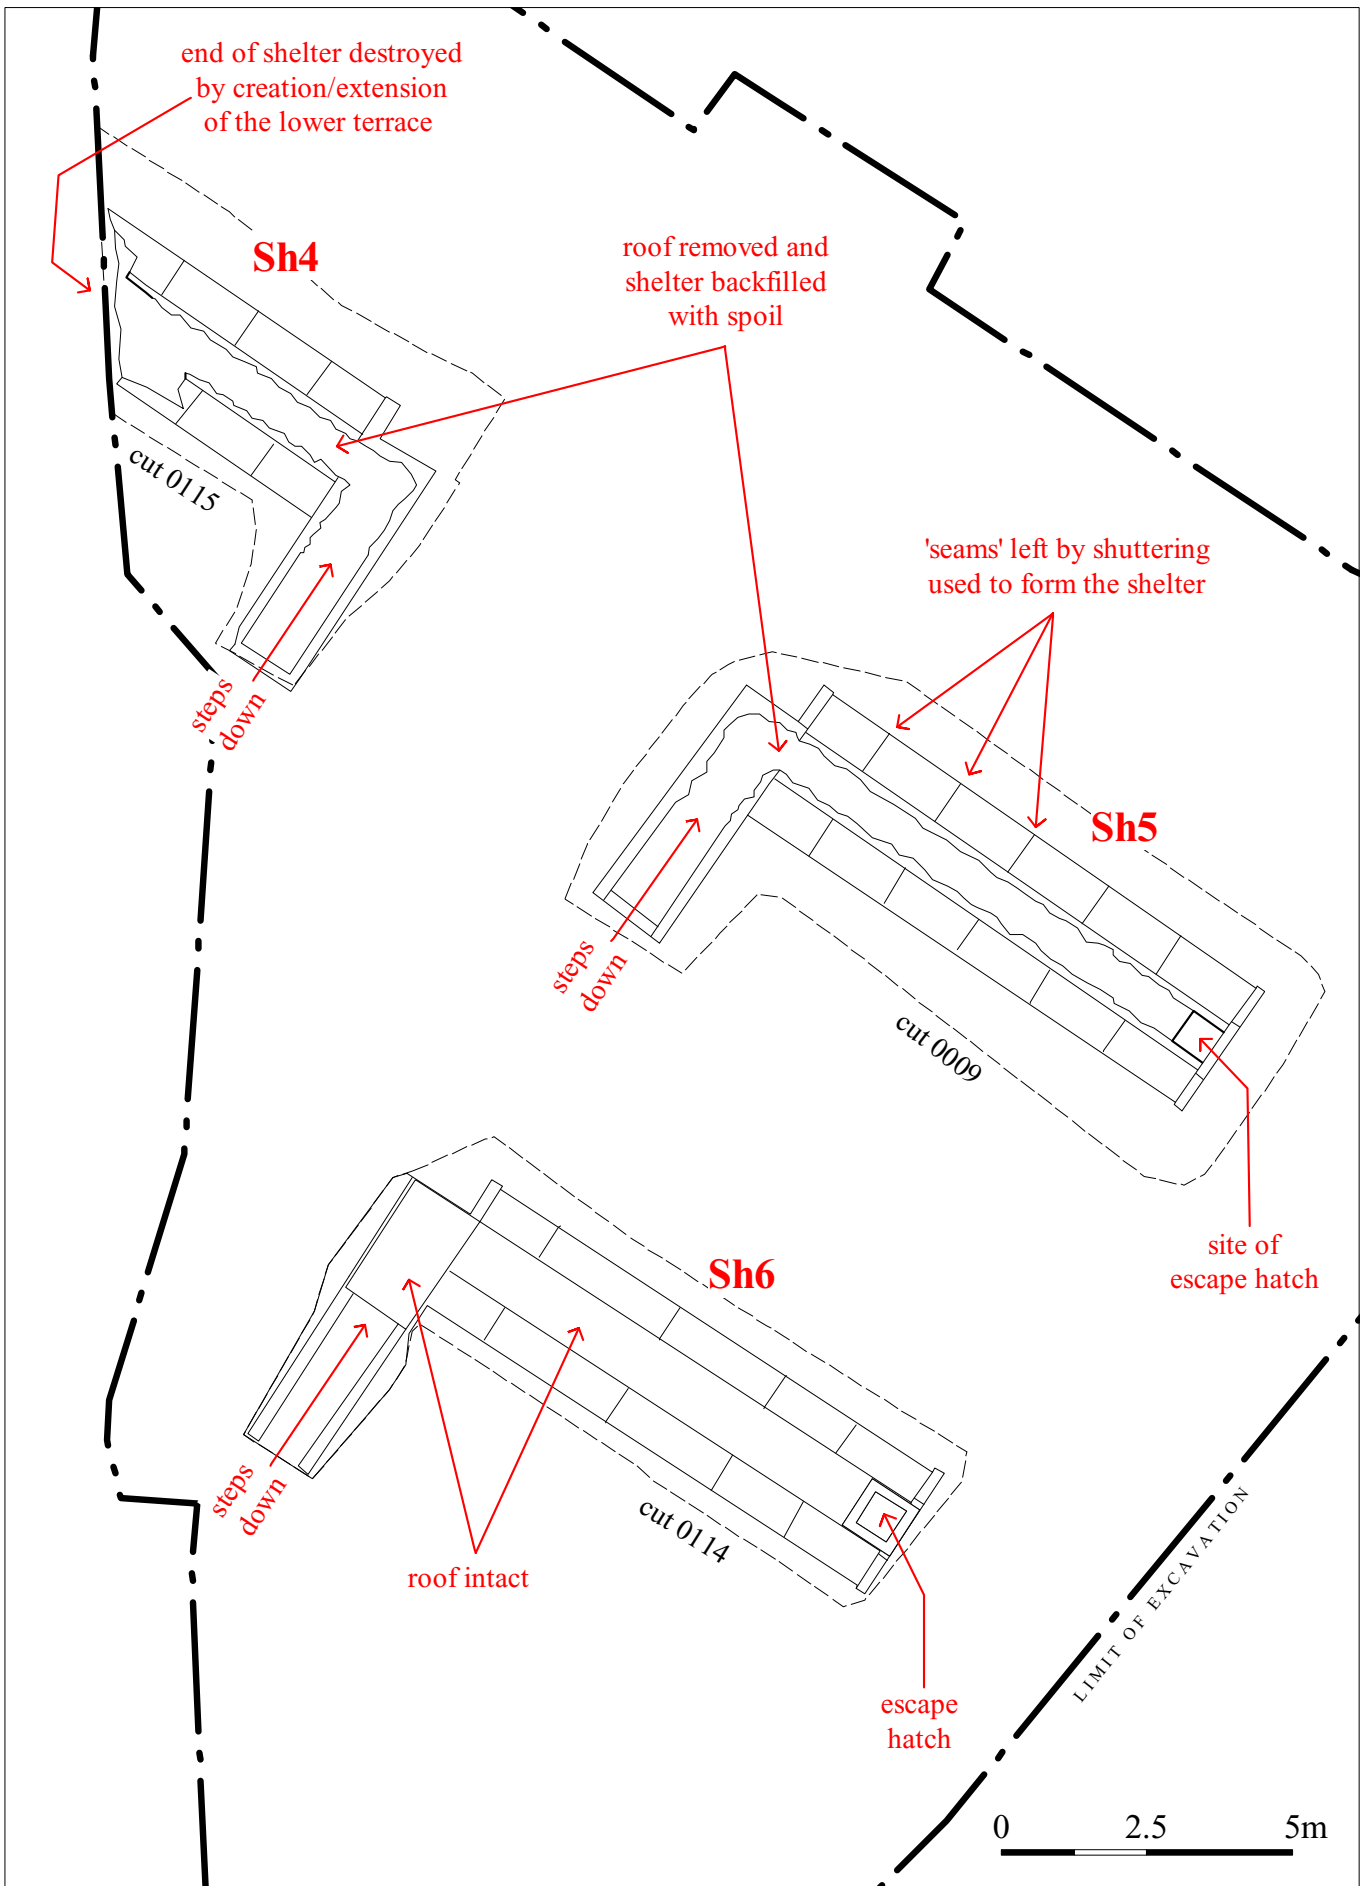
Detailed plan of the excavation area shelters (Sh4, Sh5 and Sh6)
